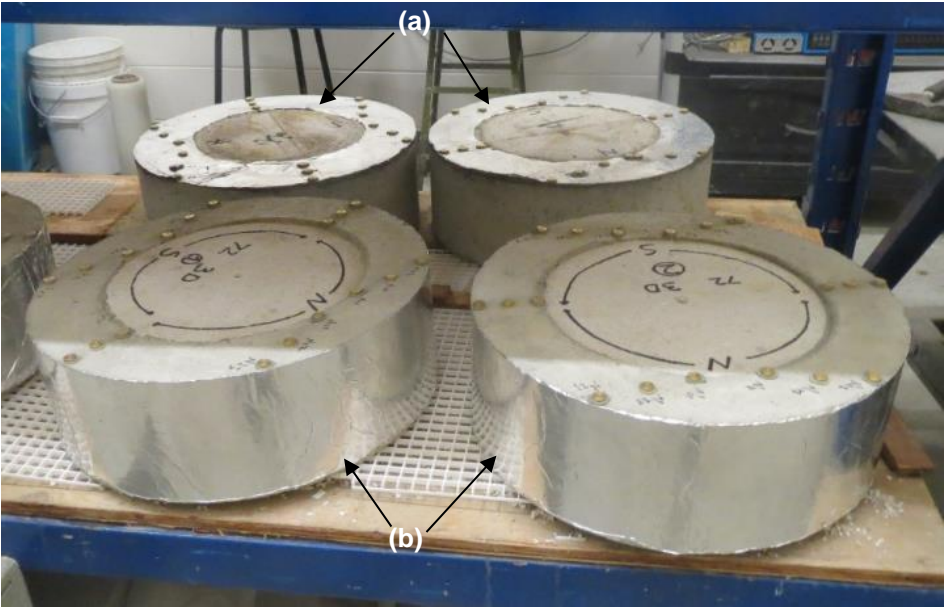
Free ring specimen with DEMEC gauges: a) sealed on top (and bottom) for radial drying; and b) sealed on the outer circumferential surface for axial drying
